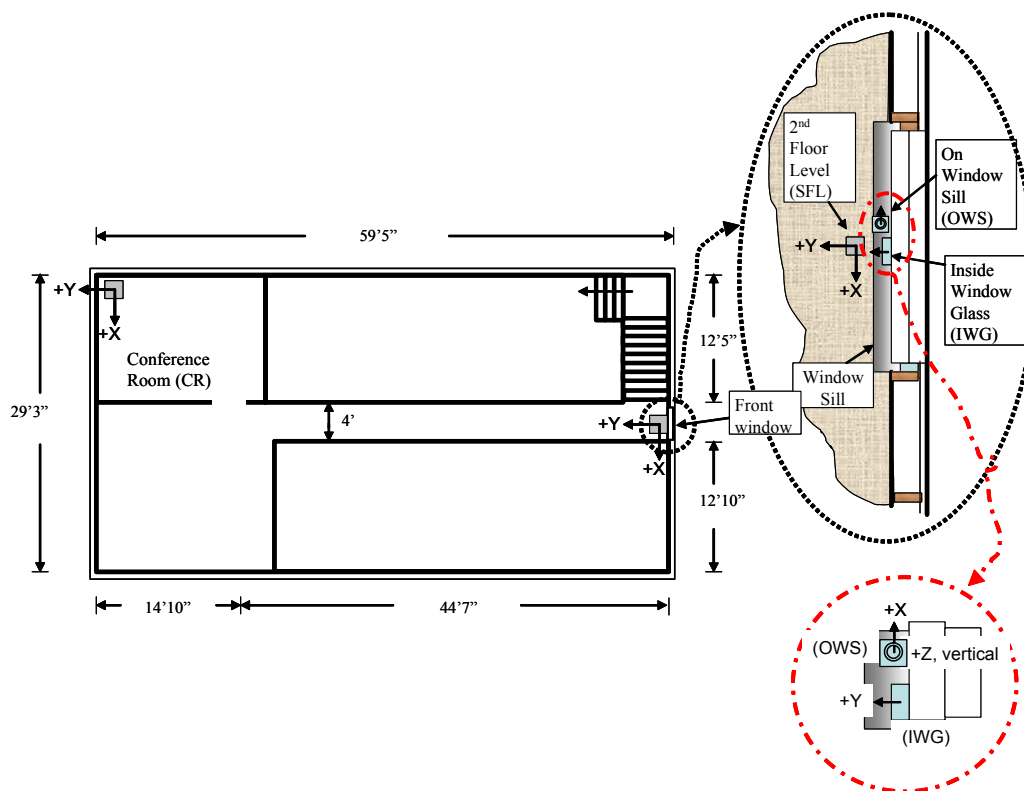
Schematic Plan of Second Floor of Building 379 (to the right is S)
